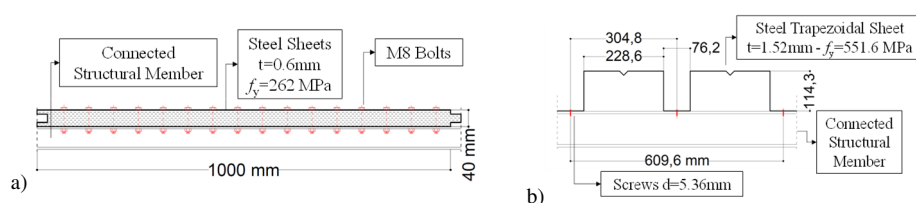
Cladding panels considered: (a) Sandwich panel; (b) Trapezoidal sheeting.
